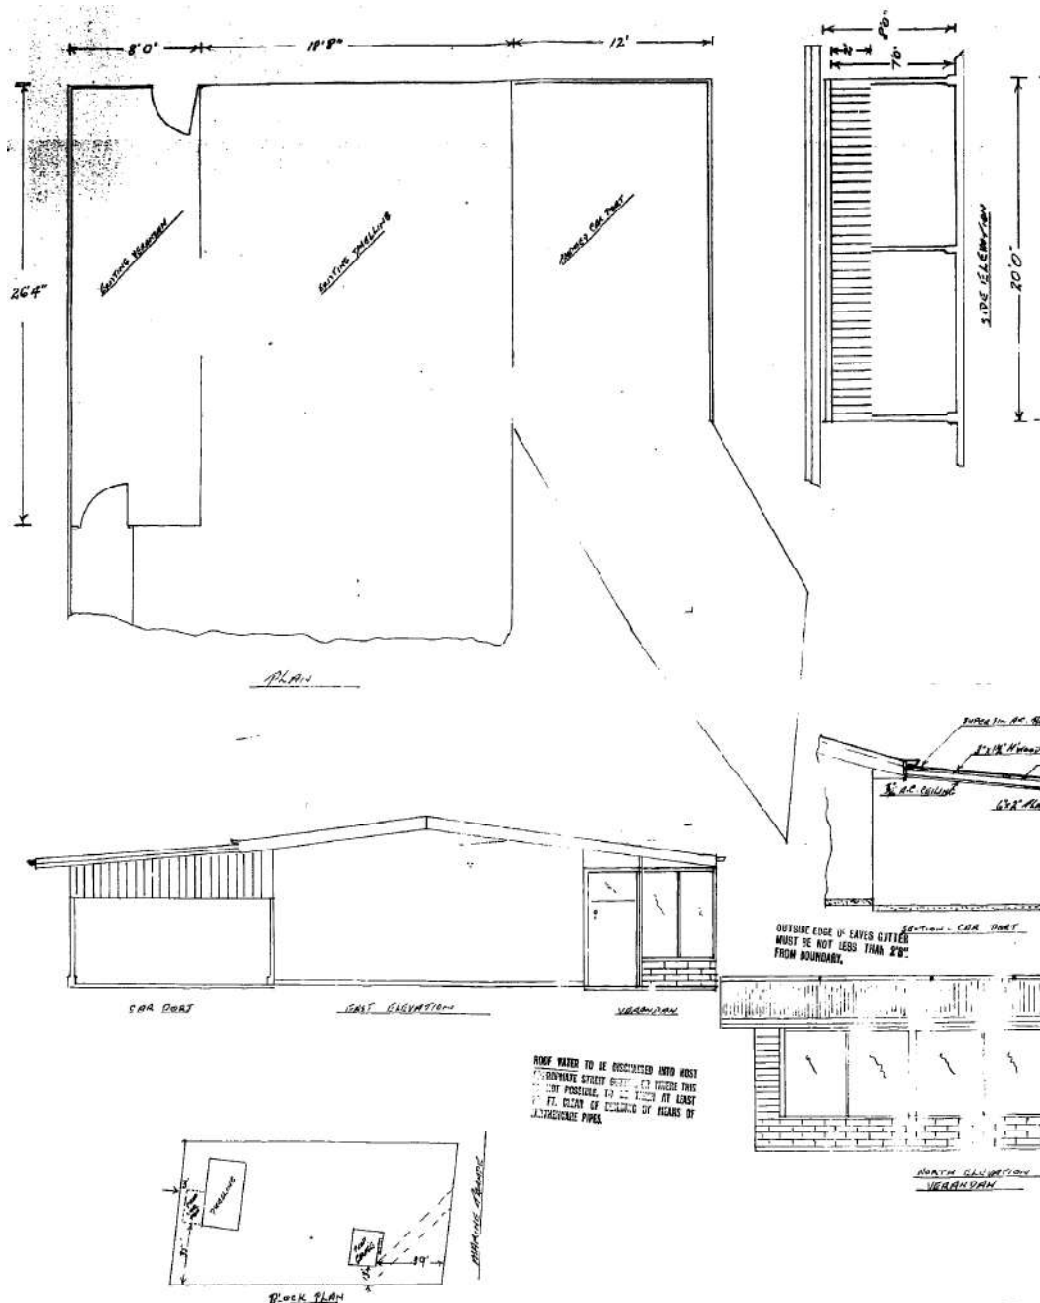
Extract of approved plan from Building Application No. 5.1971.2100.1 showing carport on the southern side of the existing dwelling with access from the rear lane (no changes are proposed to the access and parking arrangements for this dwelling)
